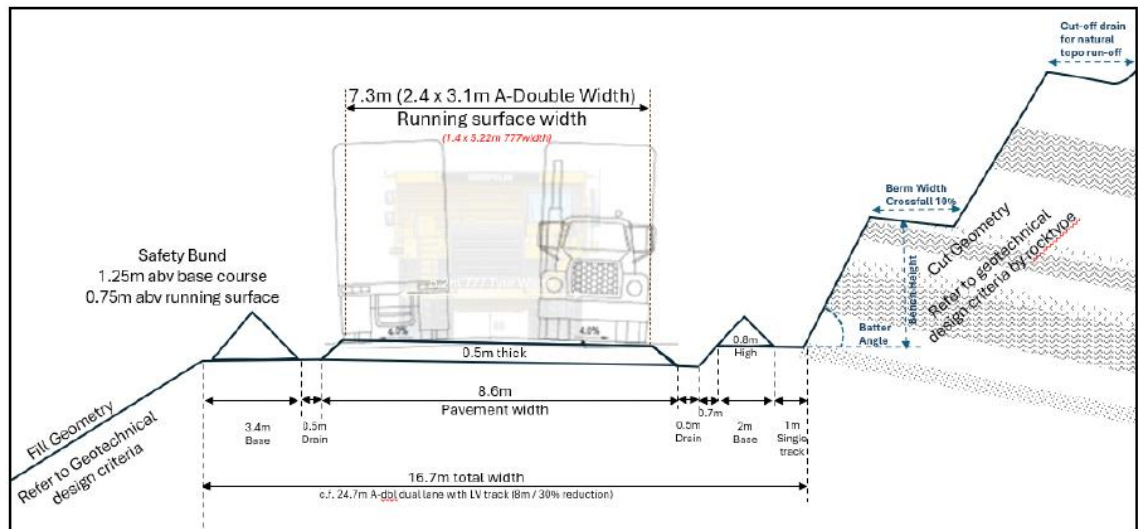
Cross section of the proposed UWHR (source: Bathurst)
